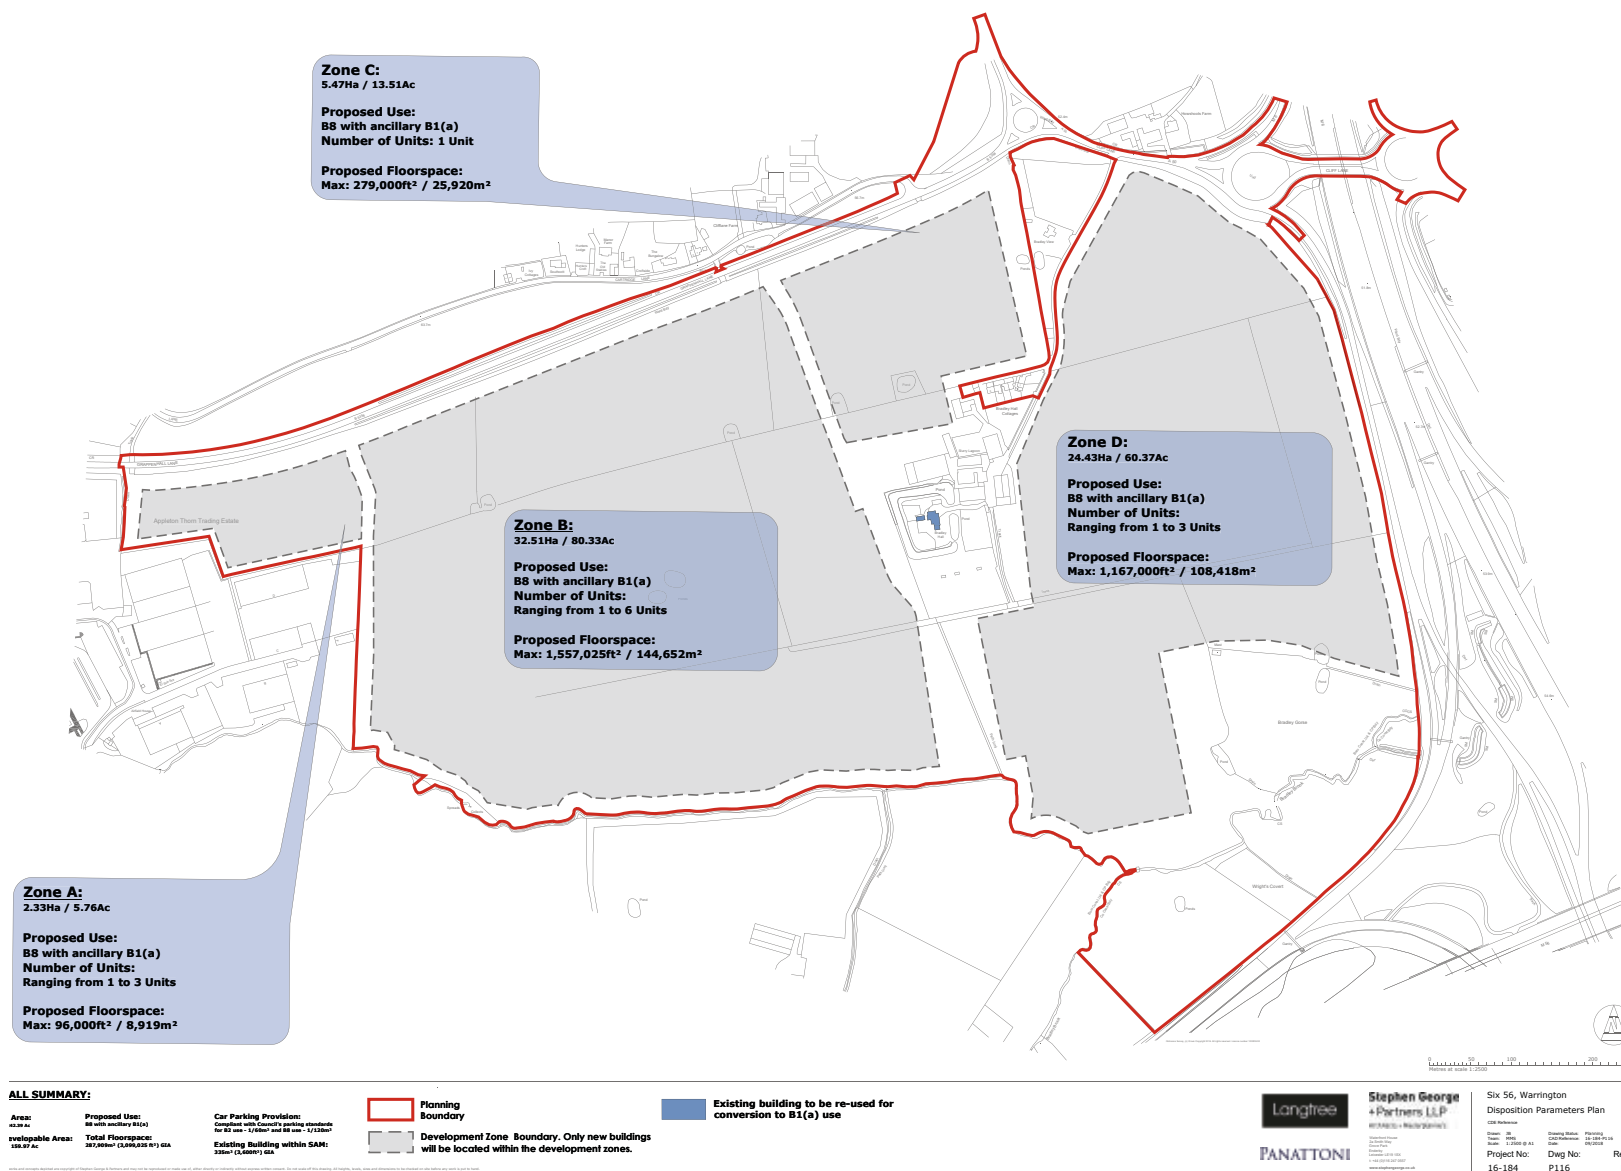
DISPOSITION PARAMETERS PLAN
